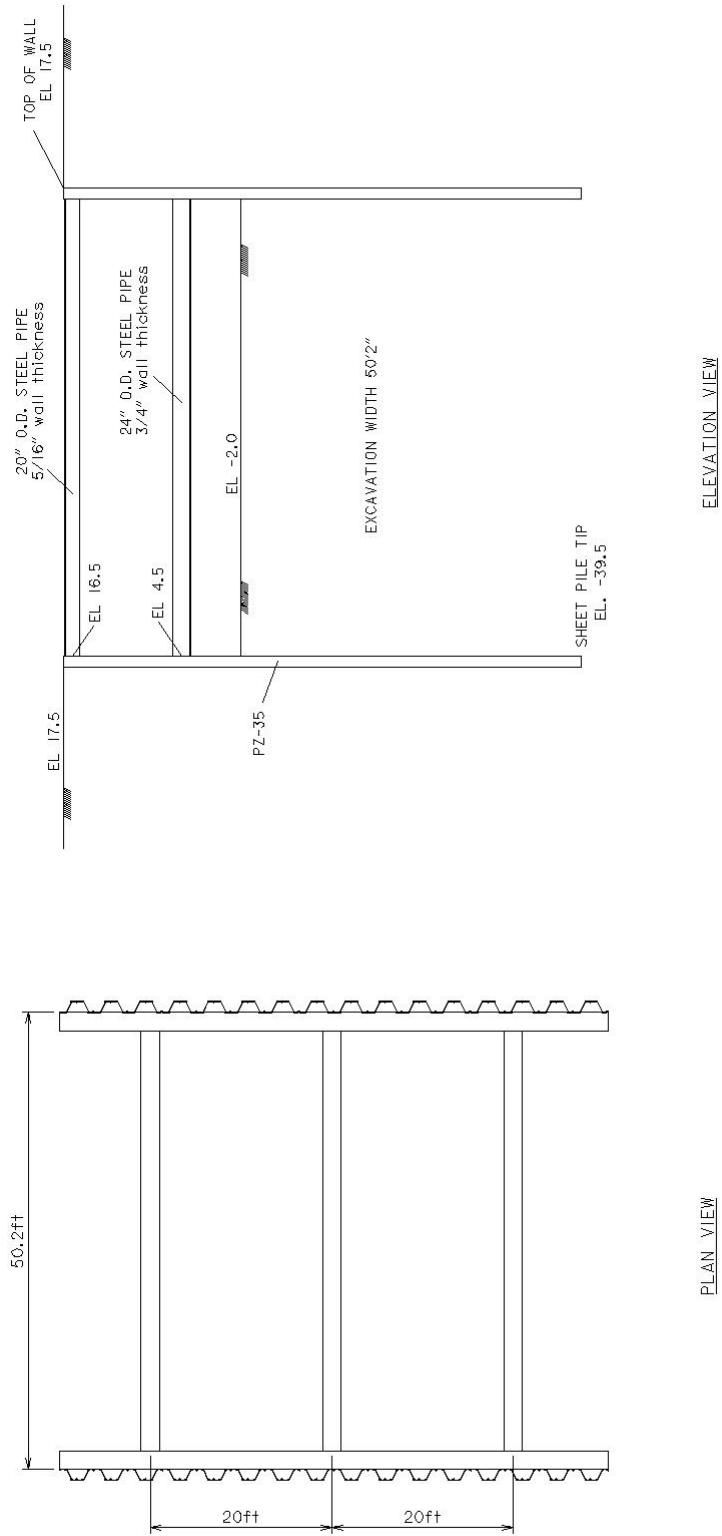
Cofferdam Components Napoleon Avenue Site – Full Excavation
